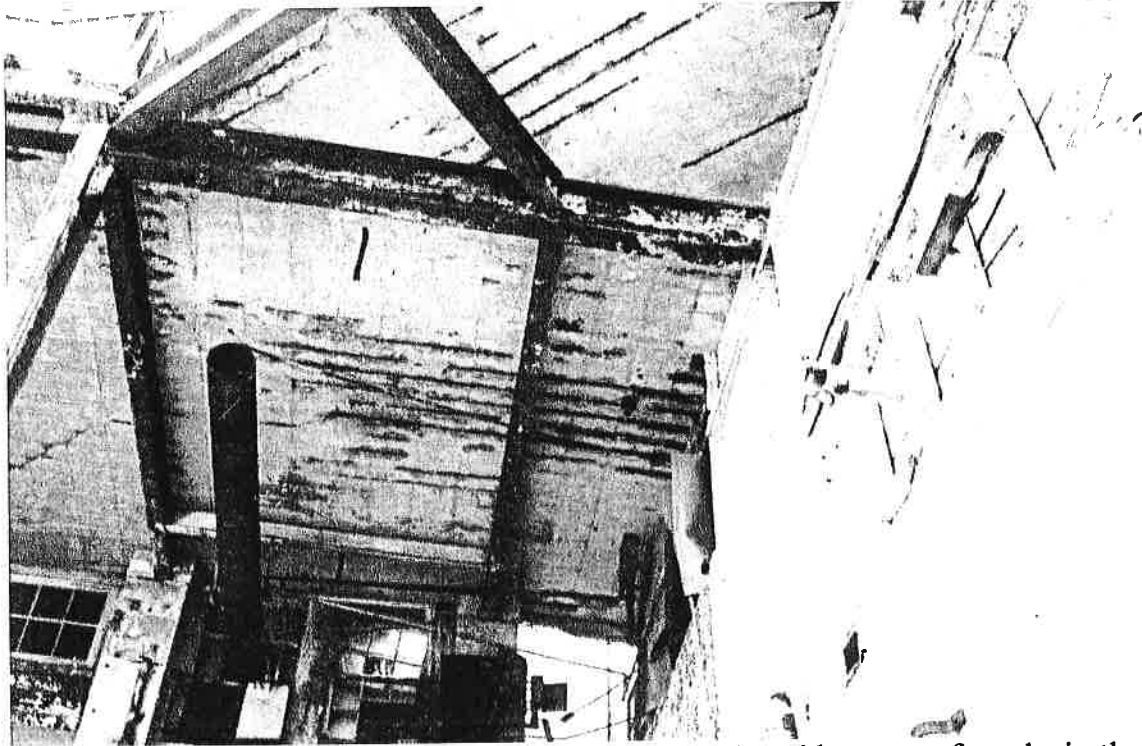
Exposed structural slab reinforcing. Note the grid pattern of cracks in the slab at the reinforcing.
